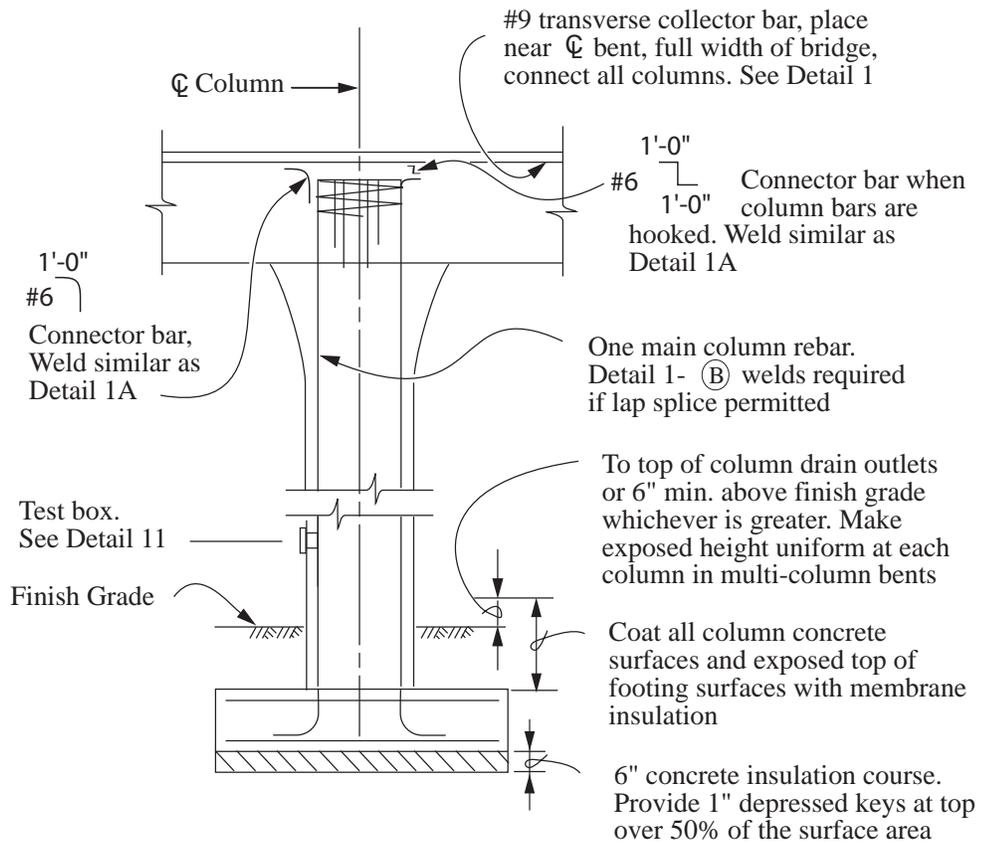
HINGED COLUMN DETAILS W/FOOTING
